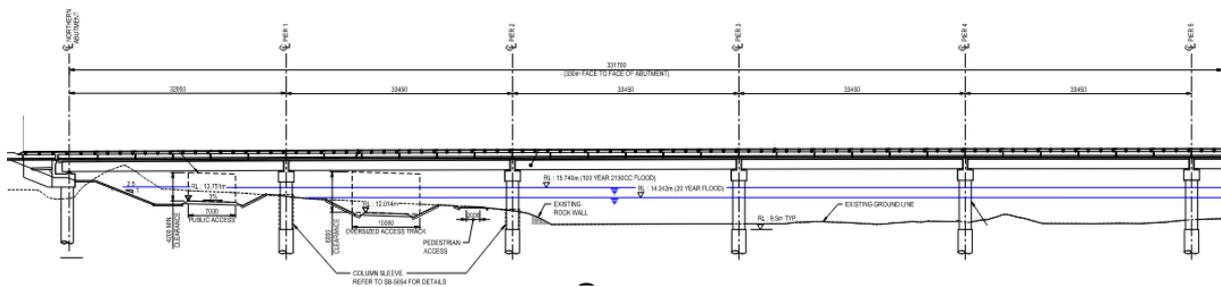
Longitudinal Section of the Bridge (only half shown for clarity)
